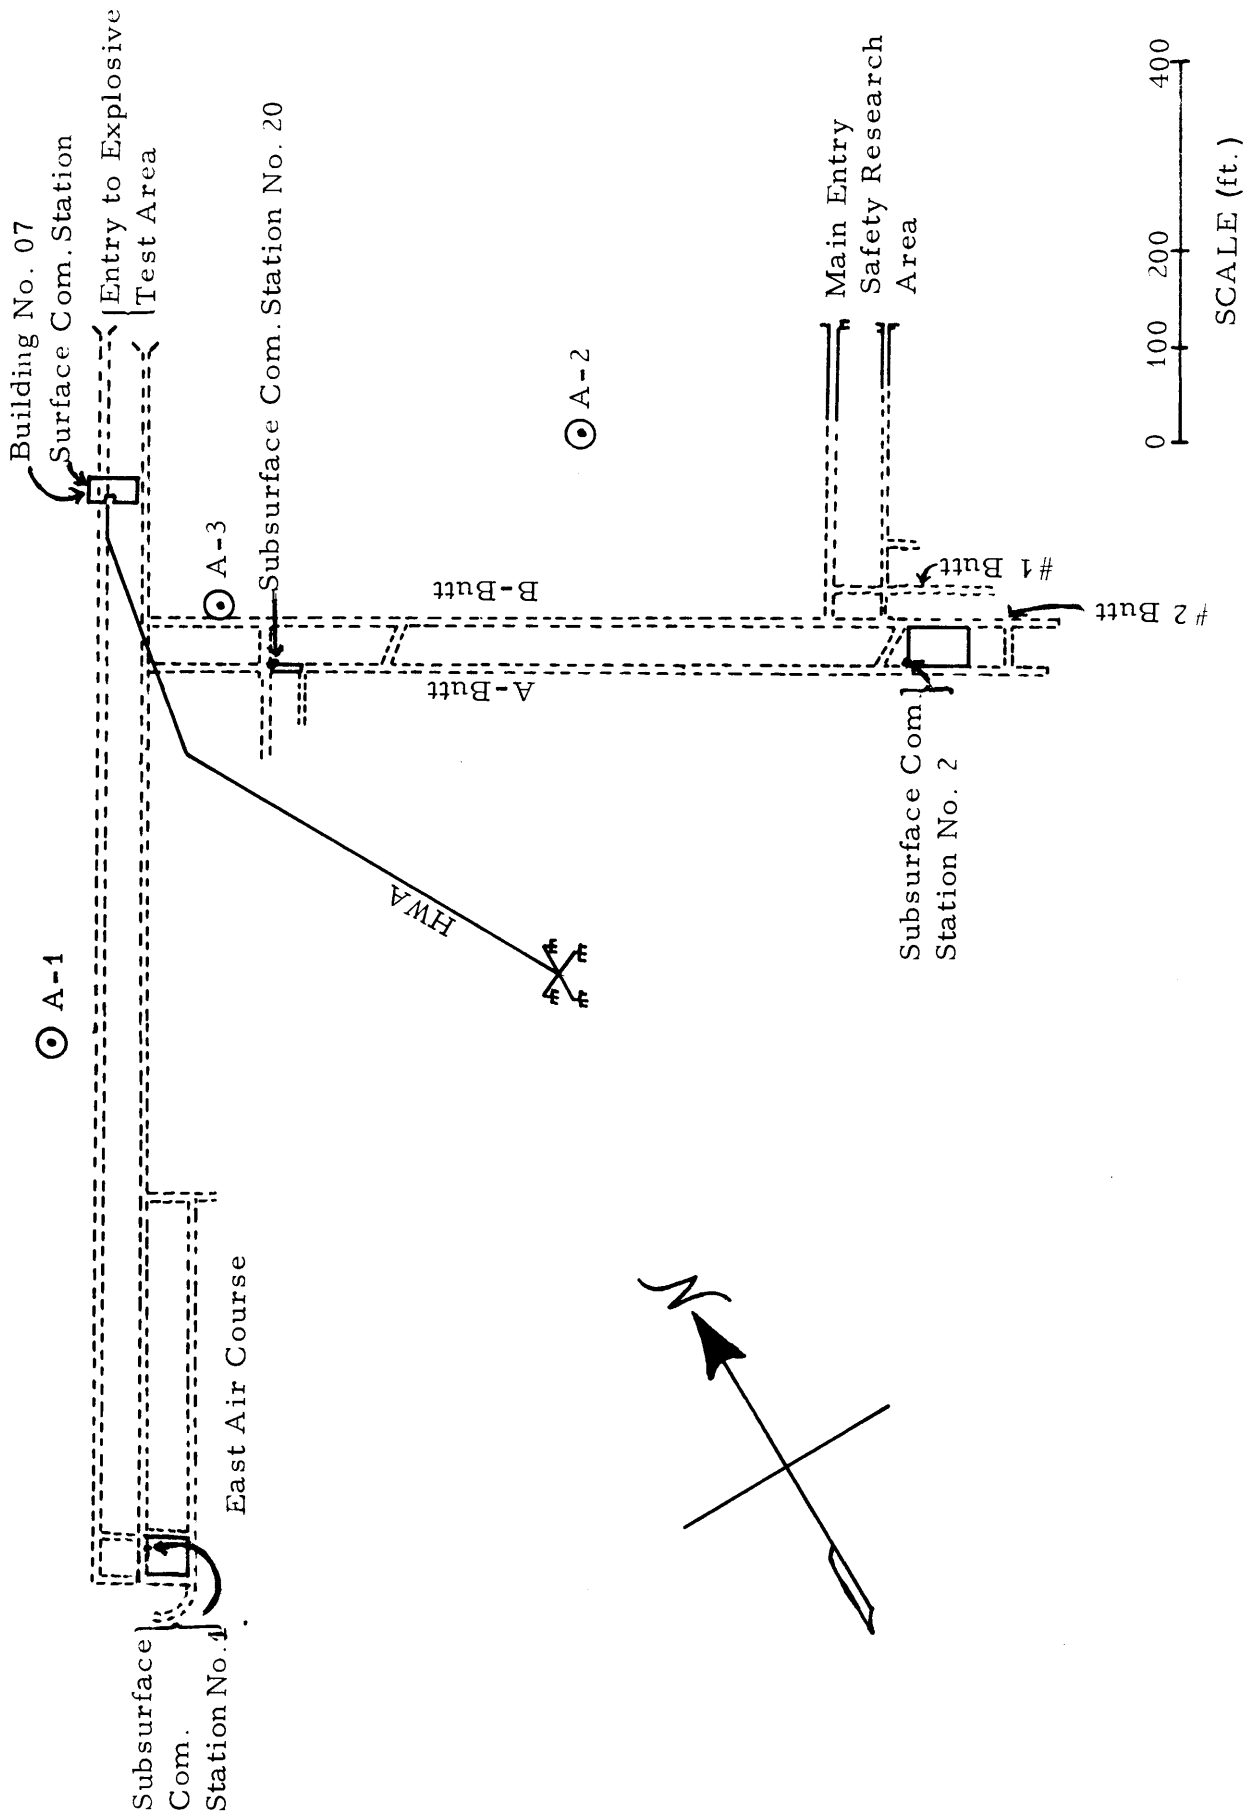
Communication and Monitoring System Installation Plan at USBM Experimental Mine, Bruceton, Pa.
